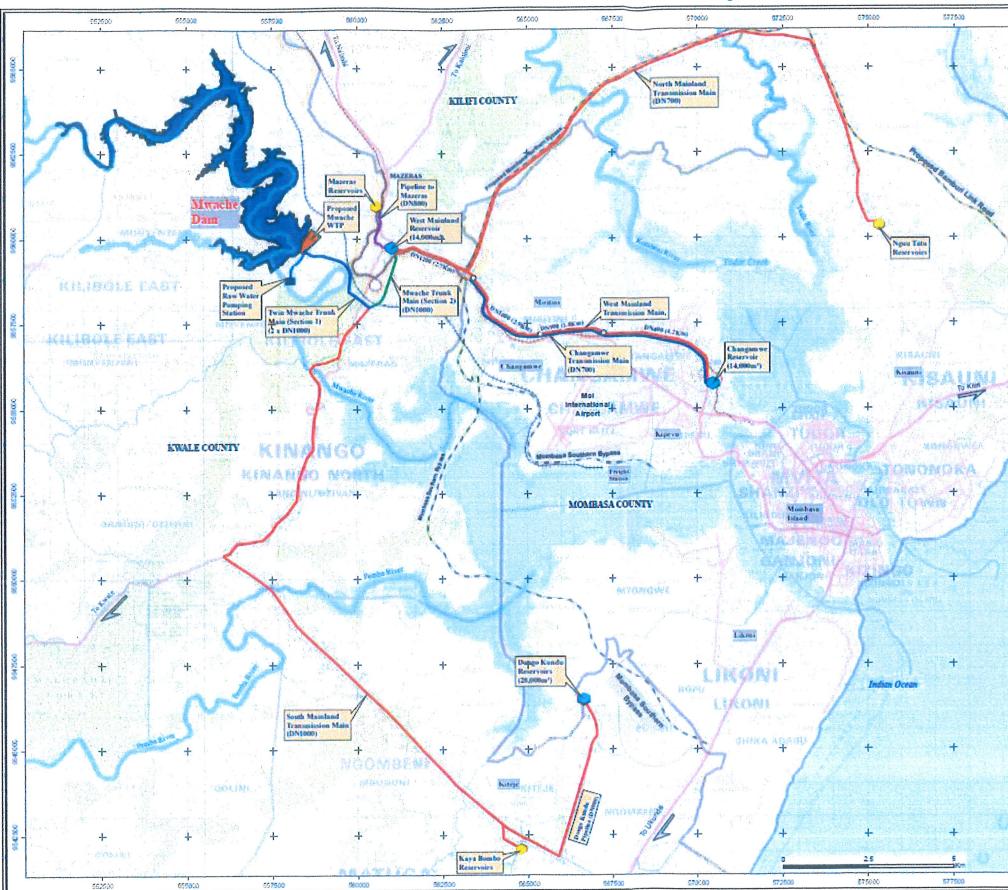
A Location Plan of the Proposed Components of the Mwache Dam Water Supply System
